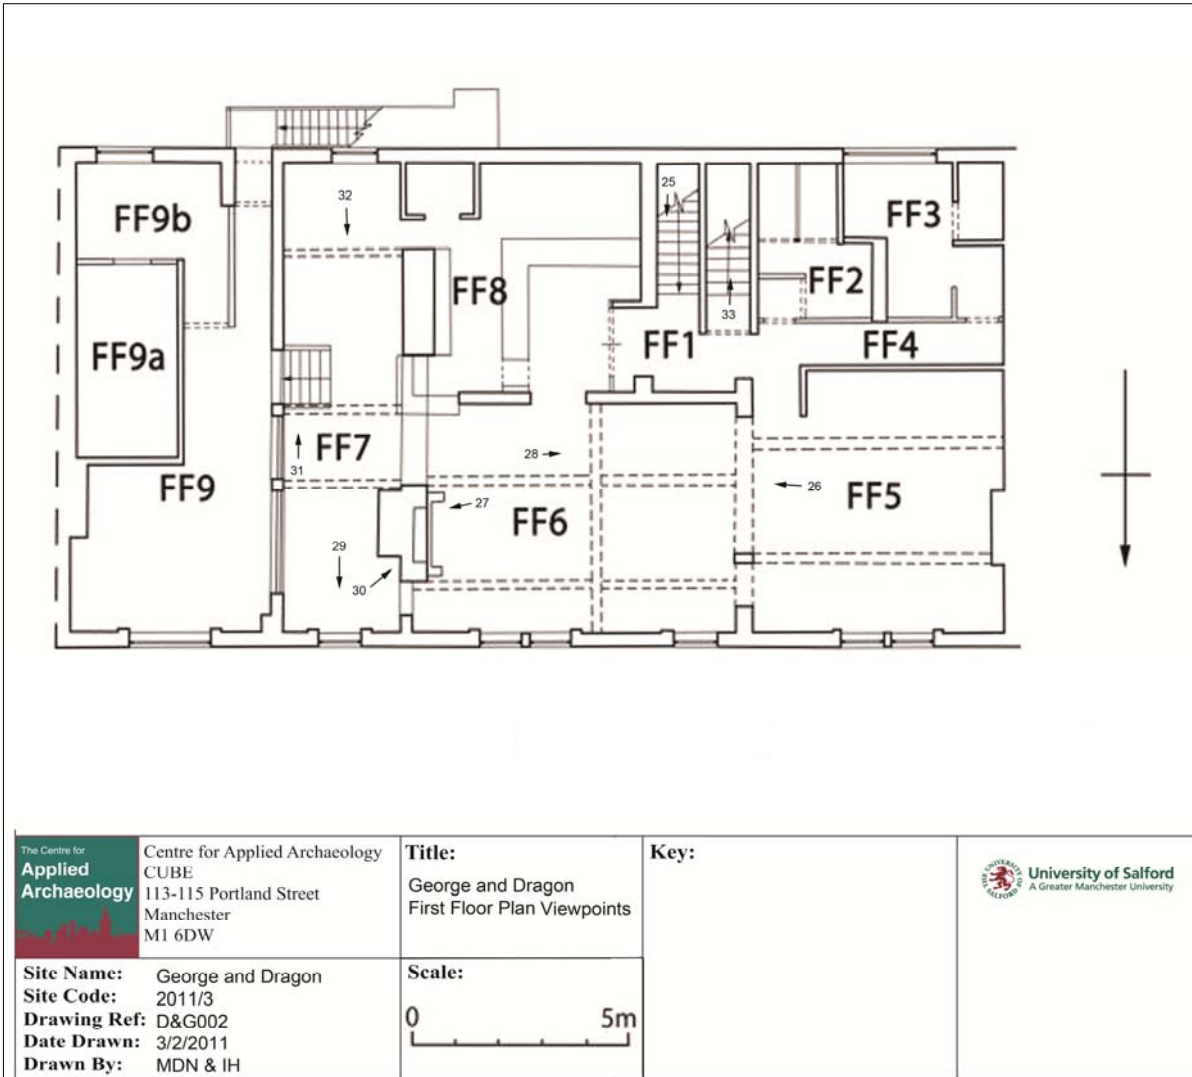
George & Dragon Hotel first floor plan showing the photographic viewpoints for the current survey and room designations.
